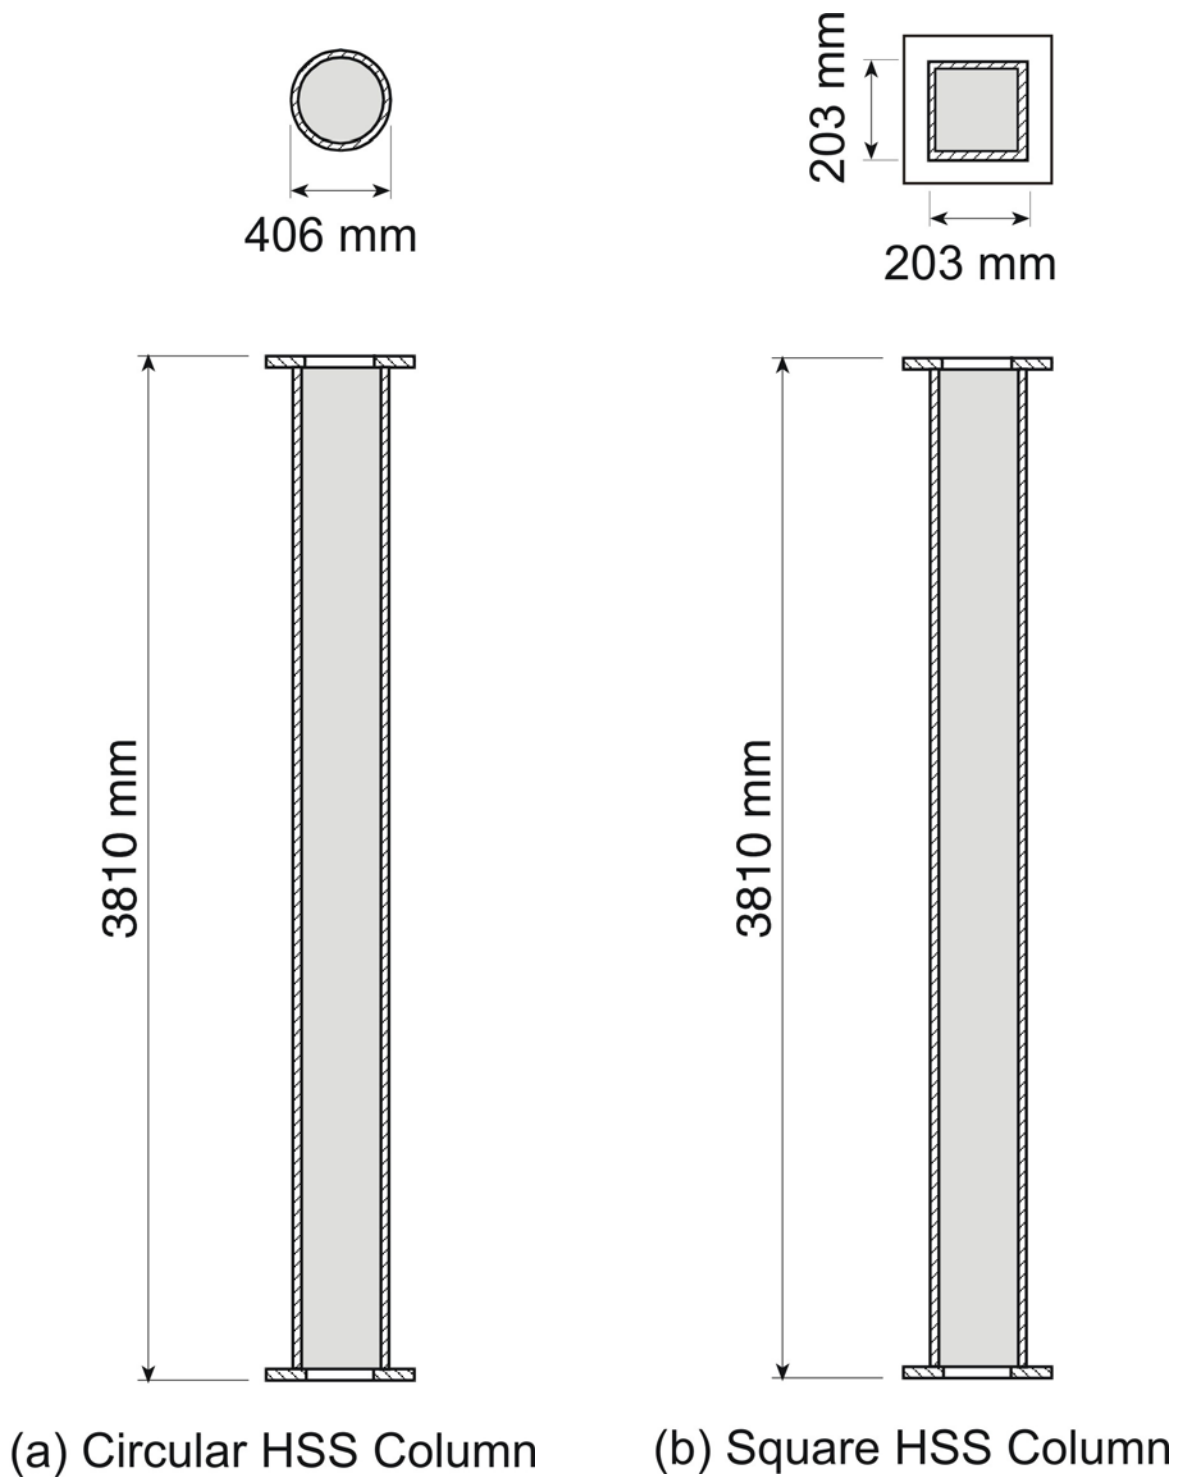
Typical elevation and cross-section of circular and of square PC- and FC-filled HSS columns
